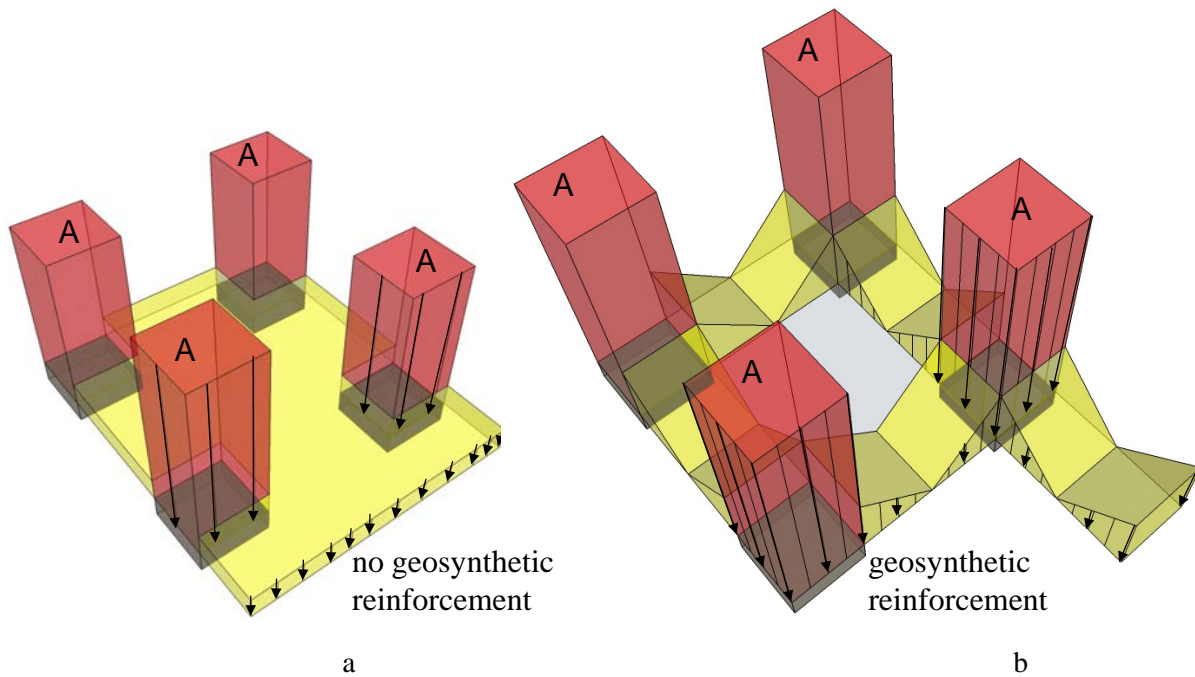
Schematized load distribution over subsoil and piles (a) just above the piles or pile caps in a piled embankment without GR and (b) just above the GR.
